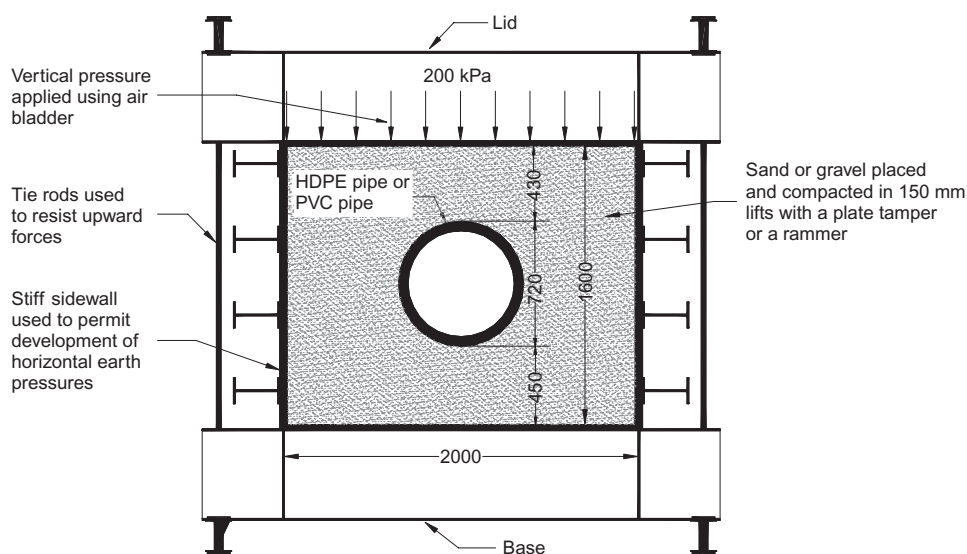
Cross-section through biaxial test cell showing backfill geometry for tests T1, T2, T5 and T6 (dimensions in mm)
